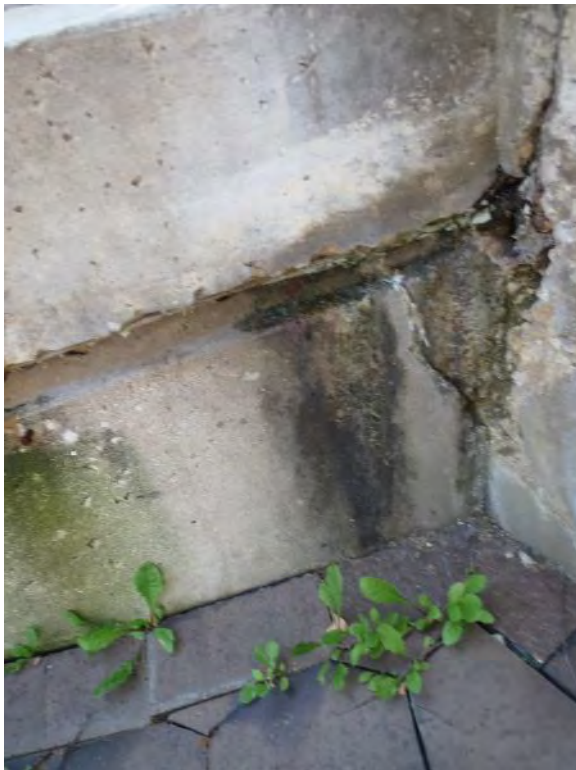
Moisture, biological growth and efflorescence at the crack at the concrete foundation wall
